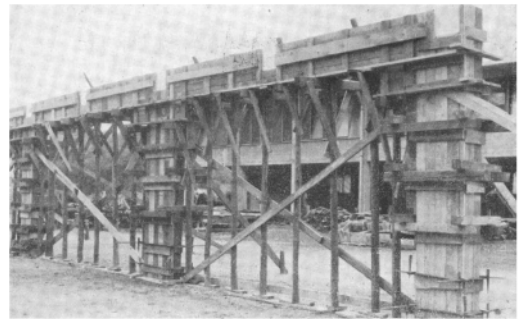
Room width is spanned by 4-part adjustable formwork girders supported by steel-tubes (Böhm & Labutin 1957, 67).
